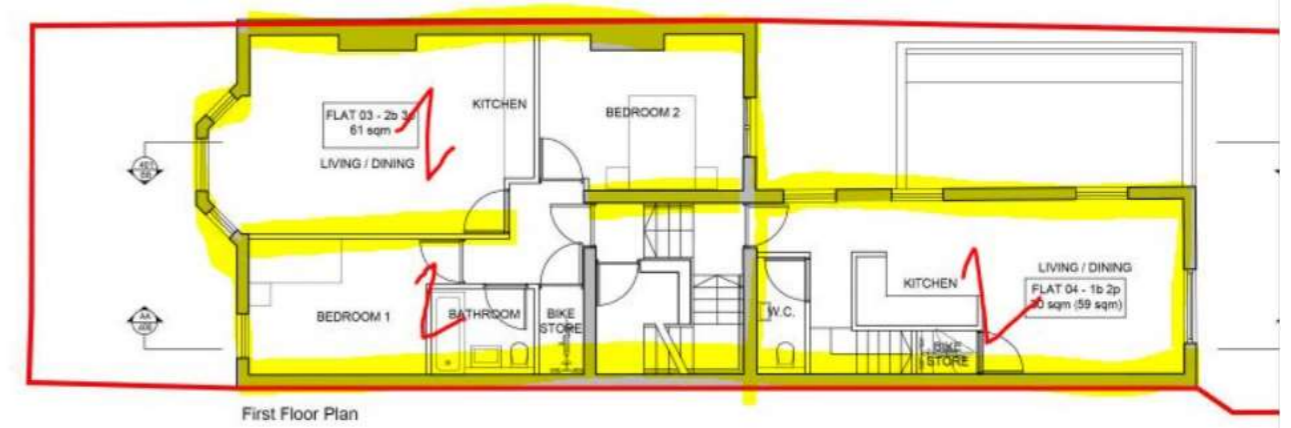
Assumed 1st floor showing span of 2nd floor over and steel beam over
